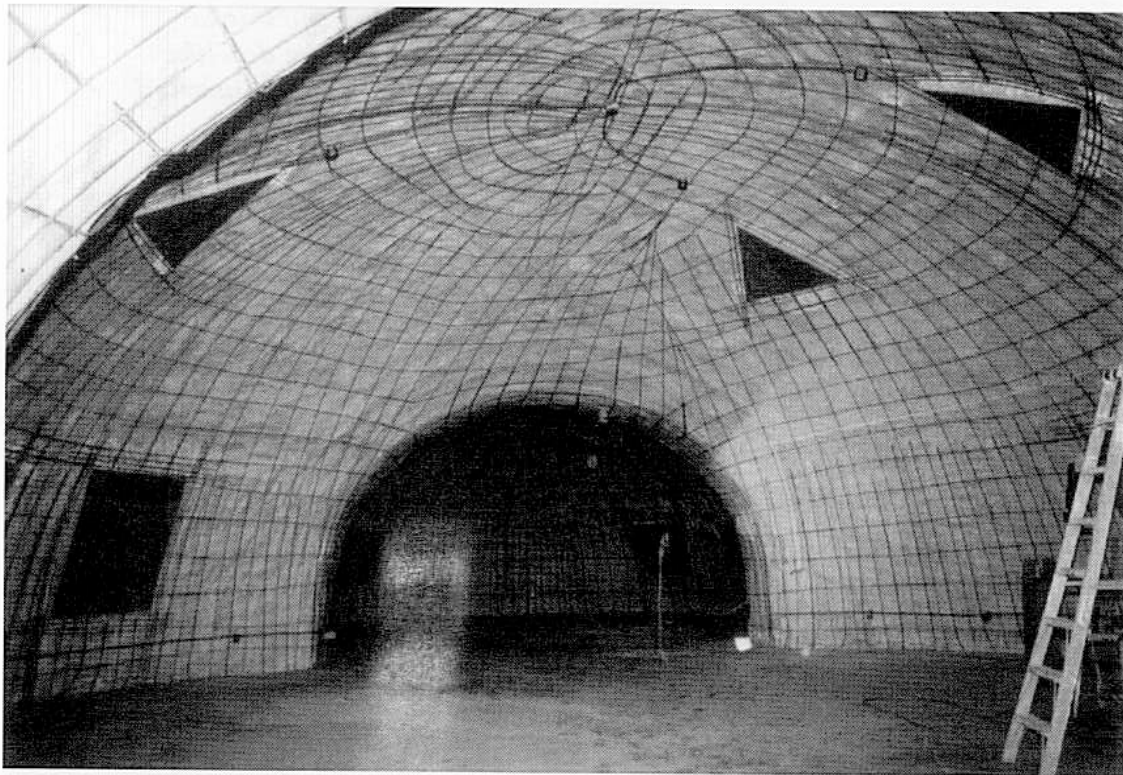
This view from the west dome toward the east dome shows the lateral and vertical rebar in place. Openings for the doors and windows have been covered with plywood.
